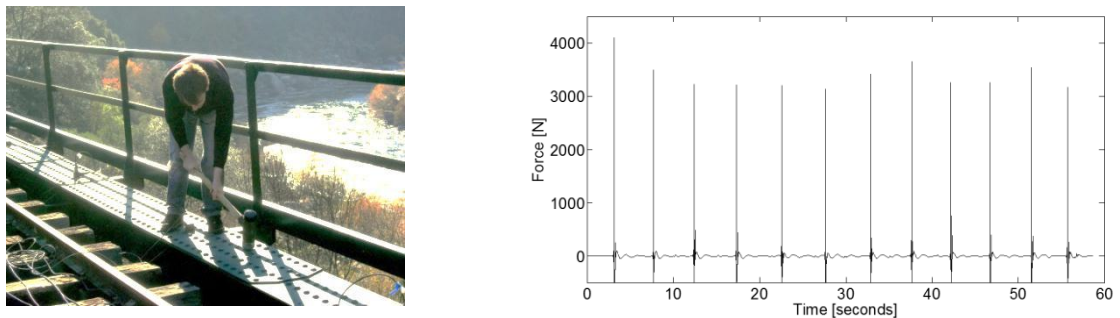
Forced vibration test on Paradela Bridge (Left) and a typical force measurement (Right)
